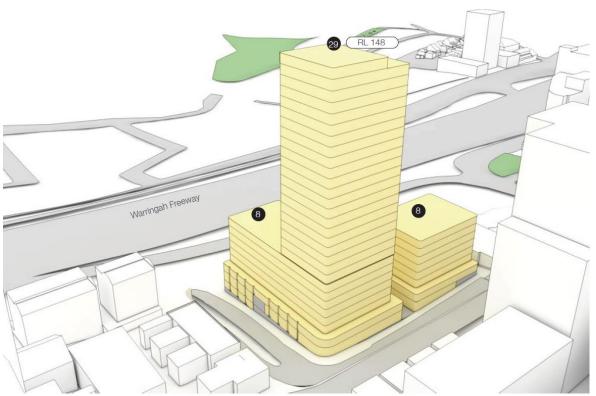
Concept plan showing elevation and articulation to Hampden street (Source: SJB)
